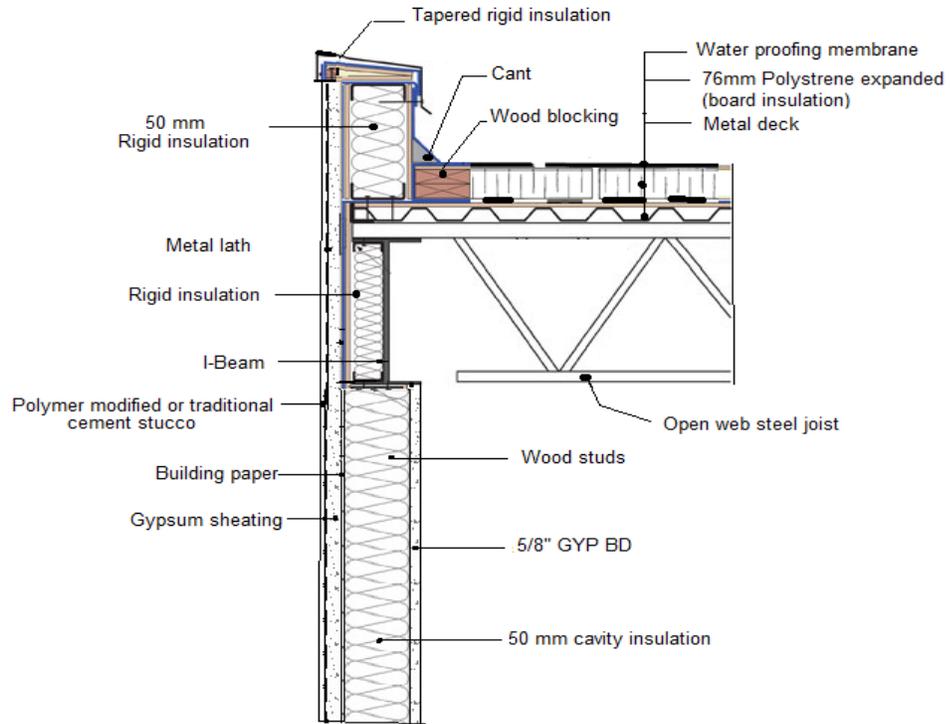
Detailed section for steel alternative with wood wall (SW)
